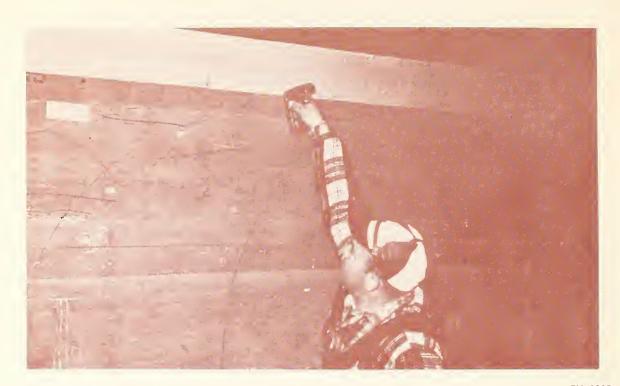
Applying paper over top of wall flues to prevent air from bypassing load.
